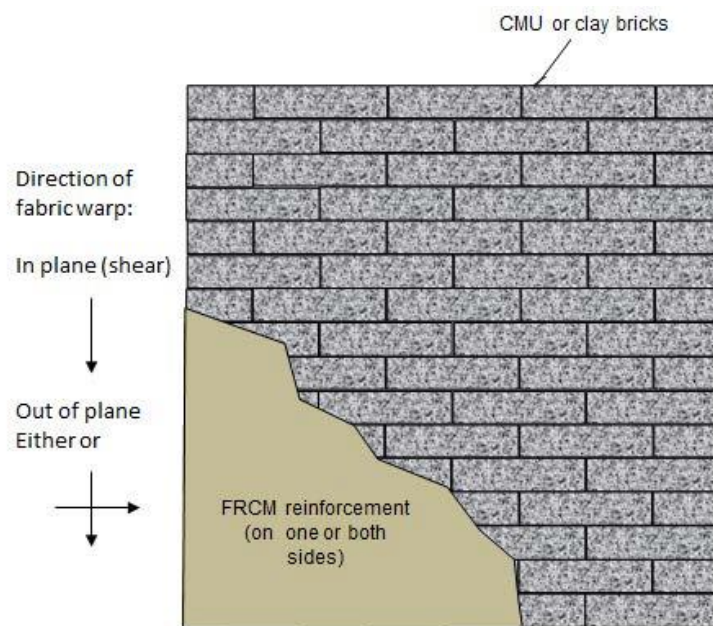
12 - Reinforcement of a masonry wall with FRCM, Arboleda et al. (2014)
